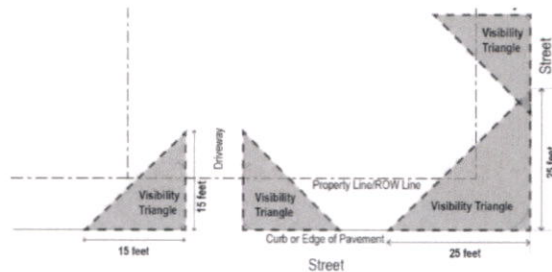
Visibility Triangles at Driveways and Intersections
